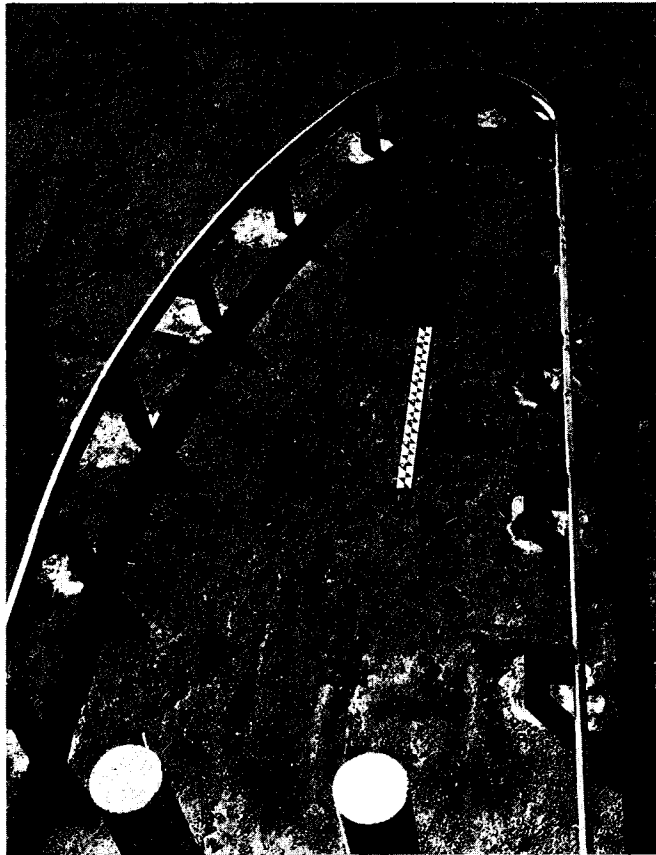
The Minnesota Five-Foot Radius Plate Beam Guardrail Prior to Test B1.
